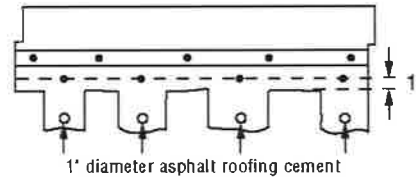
Fastening Presidential and Presidential TL Shake shingles on steep slopes.
